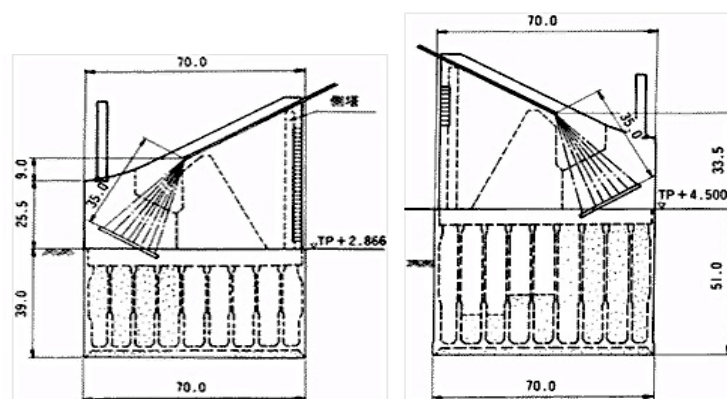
Shibaura side and Daiba side ground-anchorage [39].
